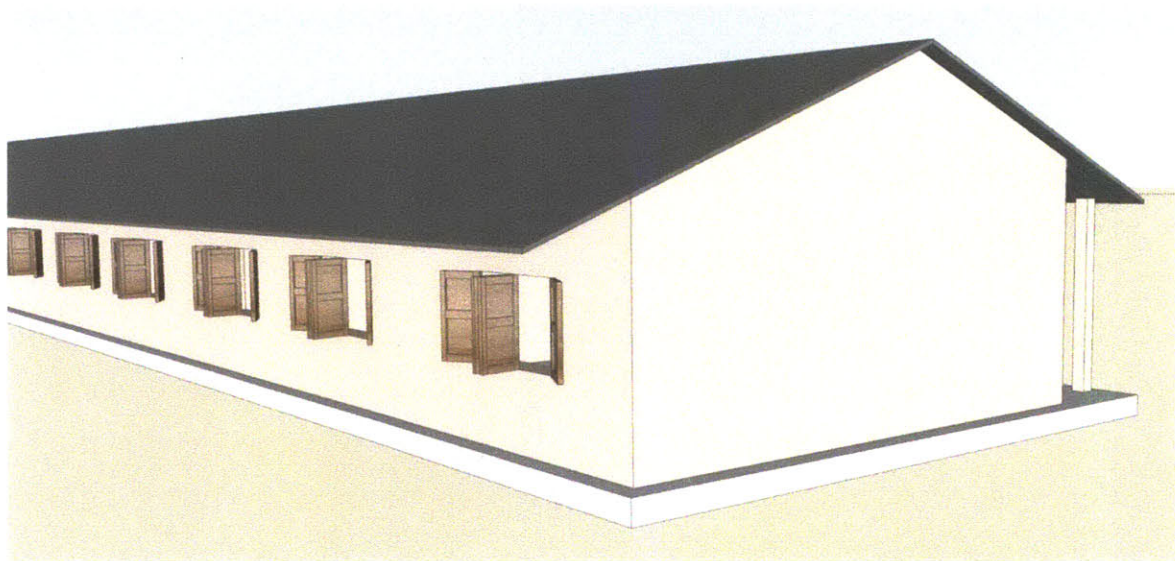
Model rendering with a 1.5 m roof overhang on both sides of the classroom
